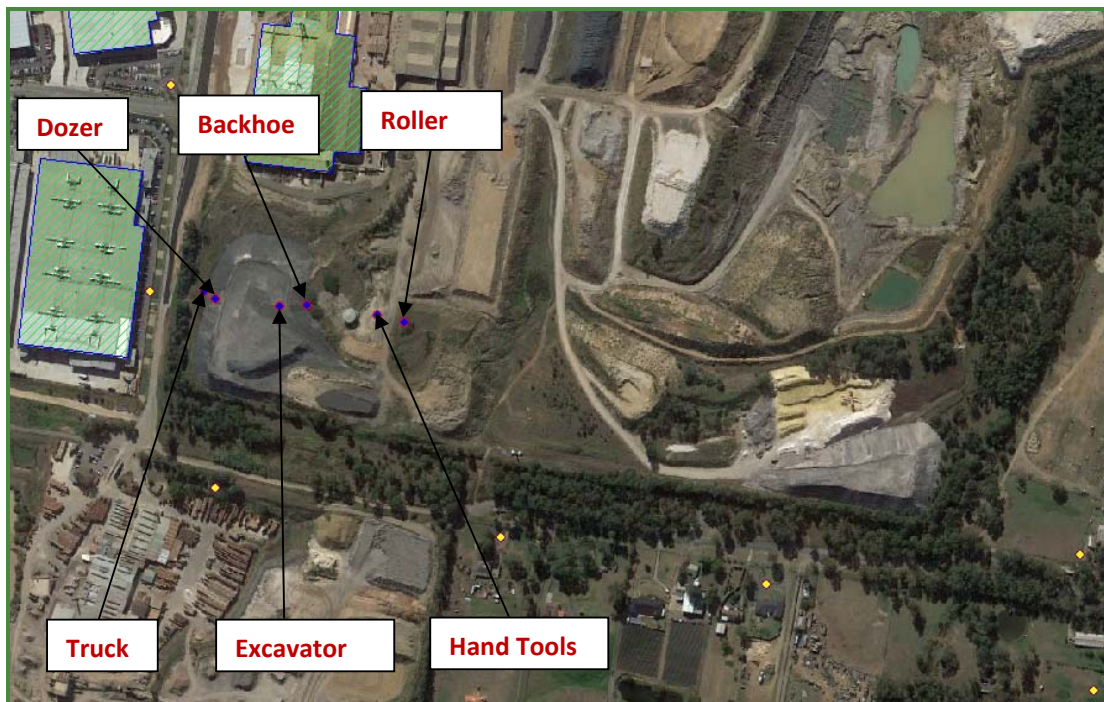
Construction Scenario 9 – Asphalting works, proposed road
